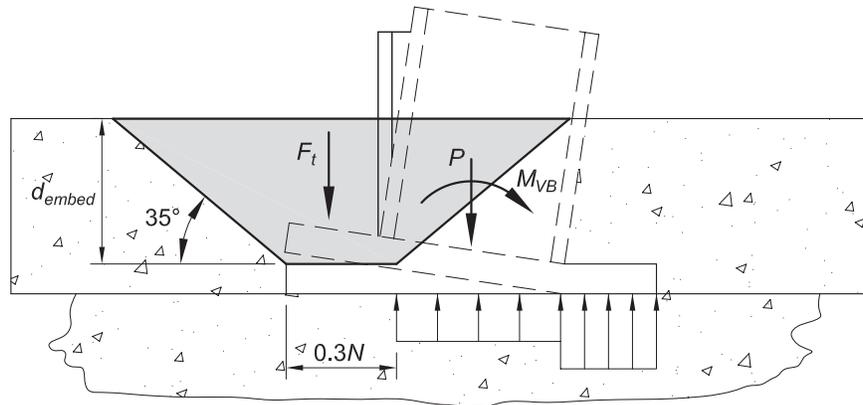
Concrete breakout force above the tension side of the connection in the absence of horizontal reinforcement.
